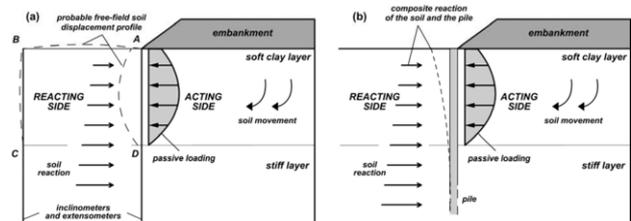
Soil movements beneath an embankment (a) free-field (b) with piles
